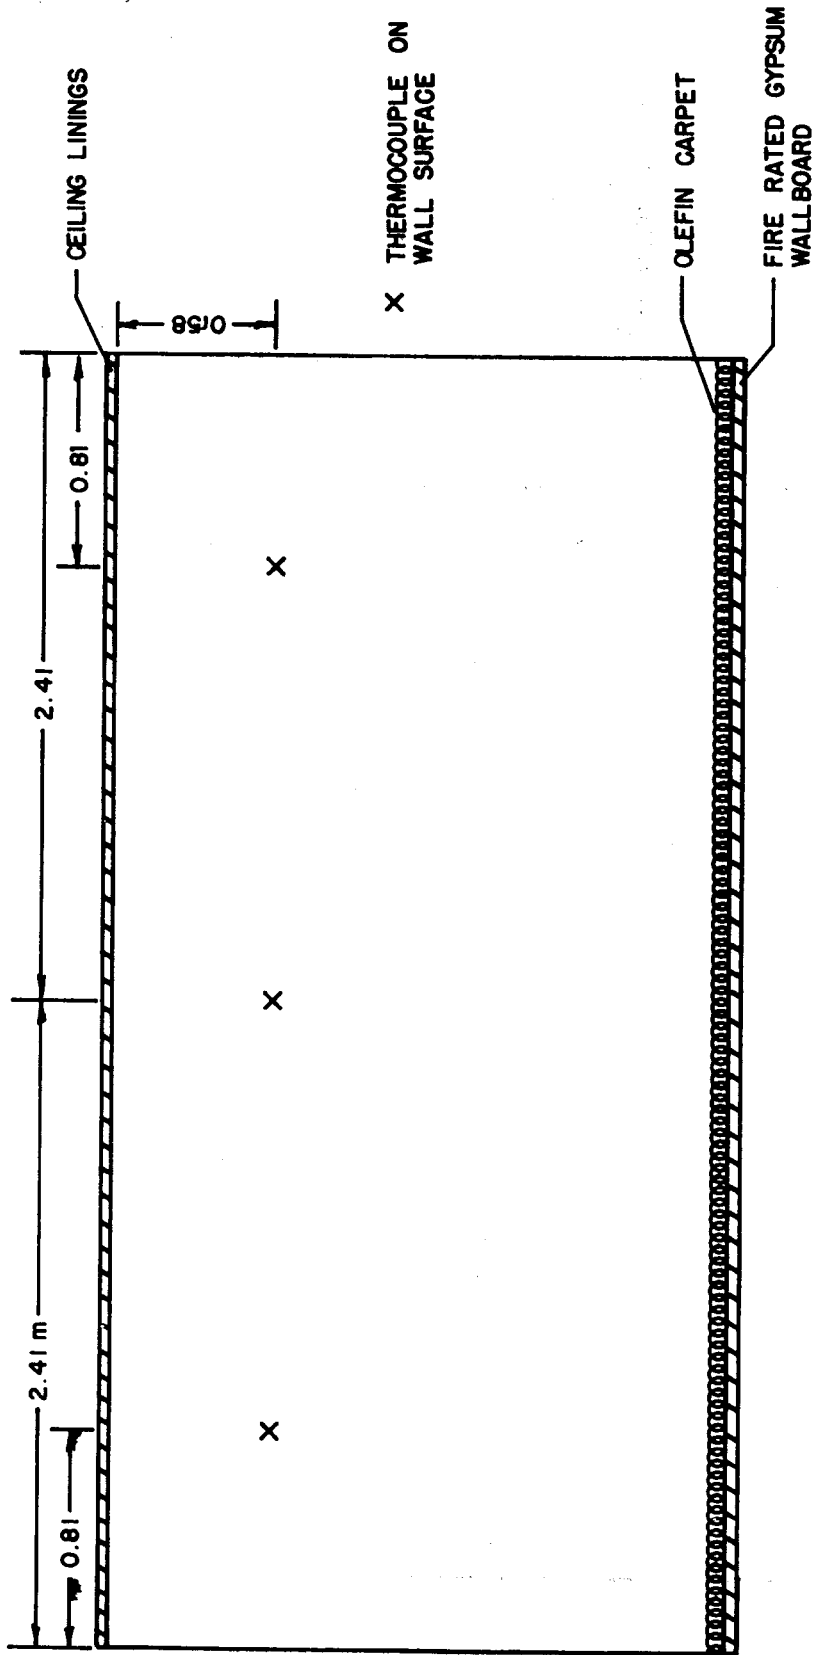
Instrumentation layout - view of north wall of the 3.3 x 4.9 m test room
